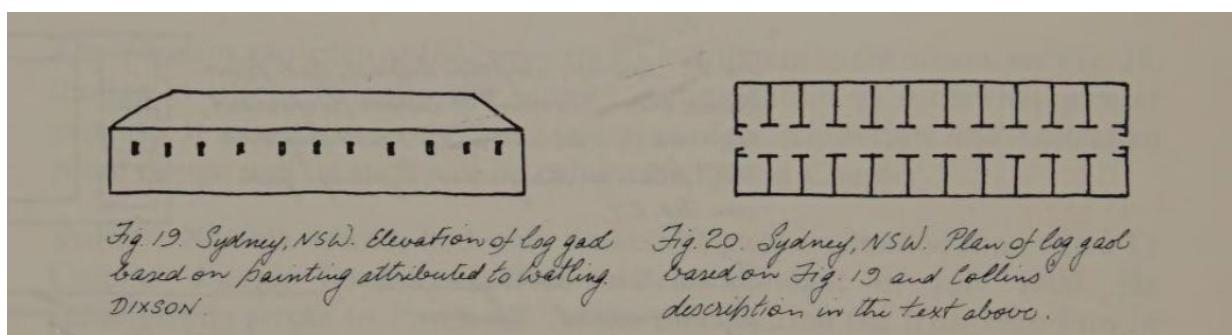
Conjectural reconstruction of elevation and plan of Sydney gaol by Kerr (Design for Convicts, p19).
